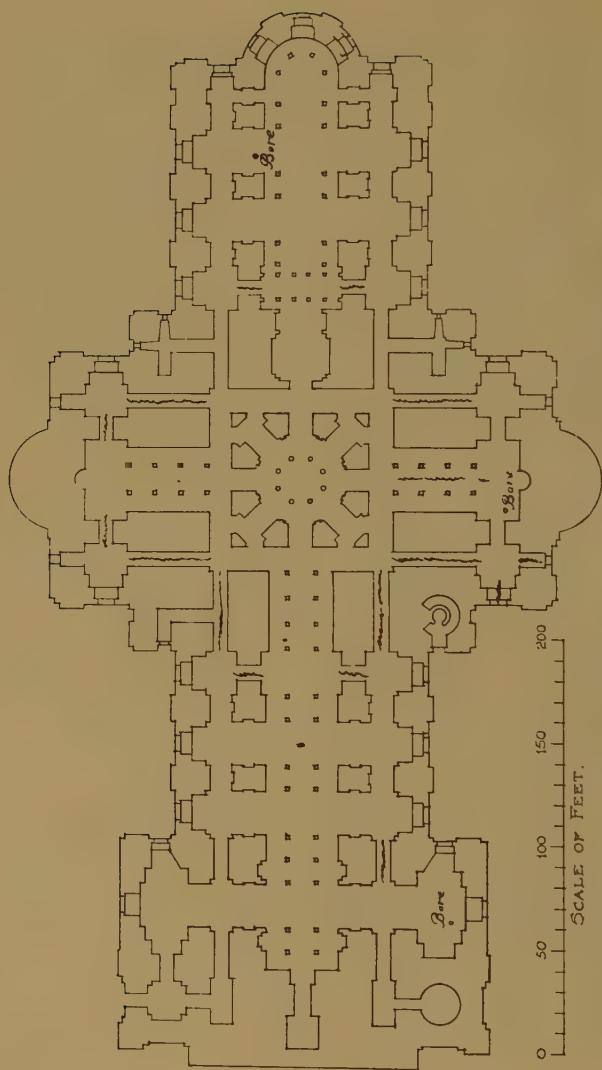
Crypt plan of St. Paul's Cathedral. Large masses of masonry provided in piers, but weights unevenly distributed upon them.
